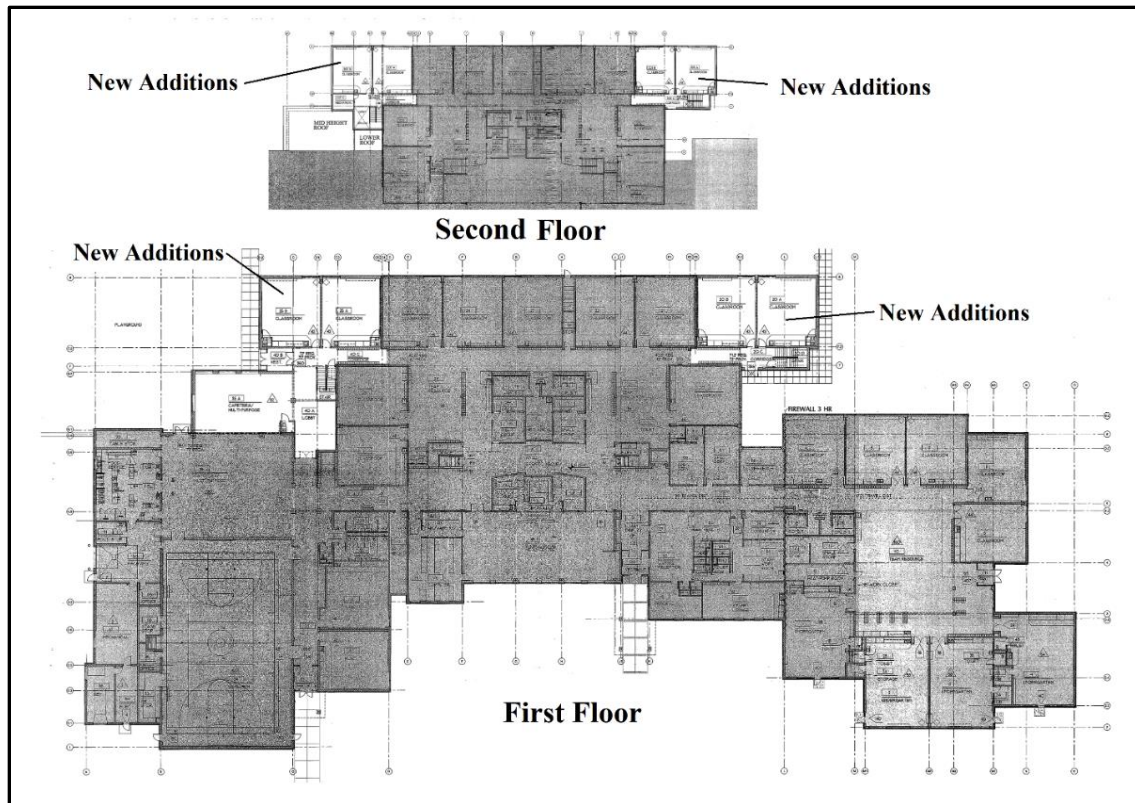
Kennedy Elementary School Floor Plan with New Additions
